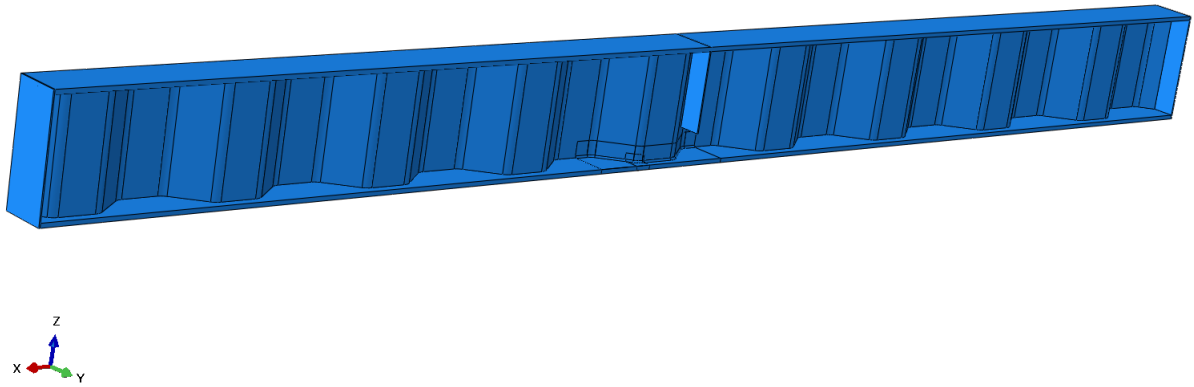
Crack location Kövesdi & Dunai (2014) weld size 6mm.
